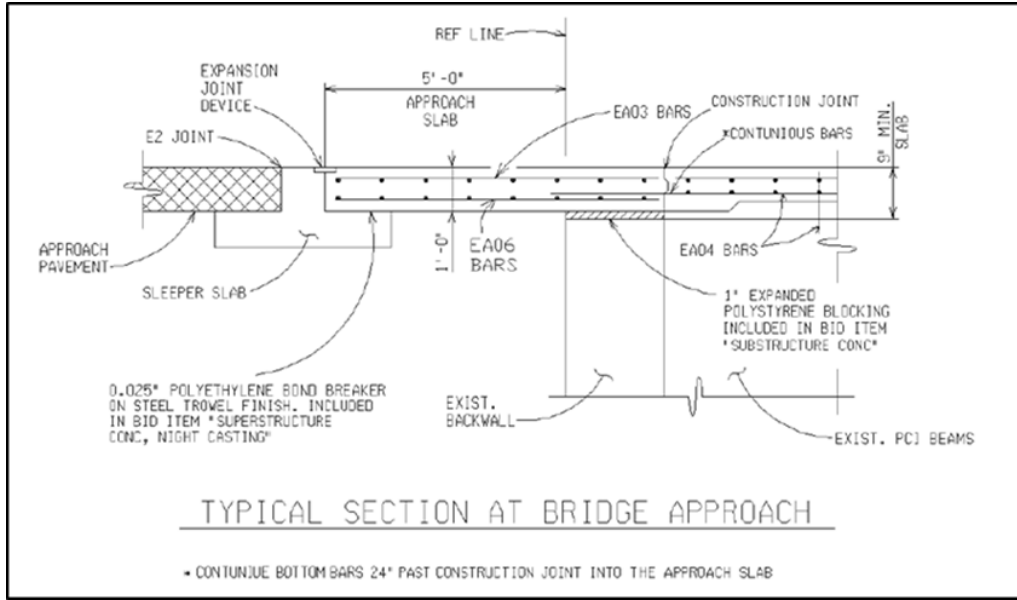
Proposed Dependent Backwall Configuration, i.e. Construction Joint over the Backwall Face at the Span Side with Continuous Bottom Reinforcement (Aktan et al. 2008)
